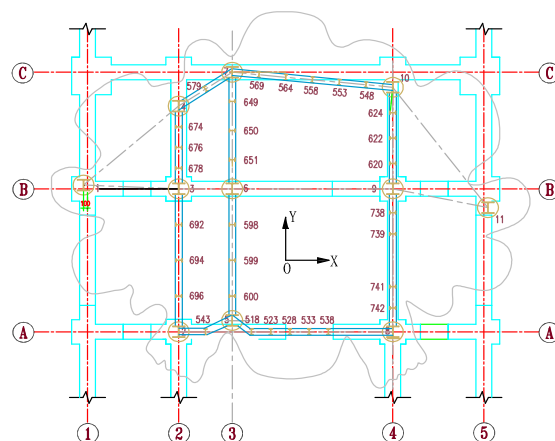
Plane arrangement chart of steel-concrete (SC) composite shear wall
